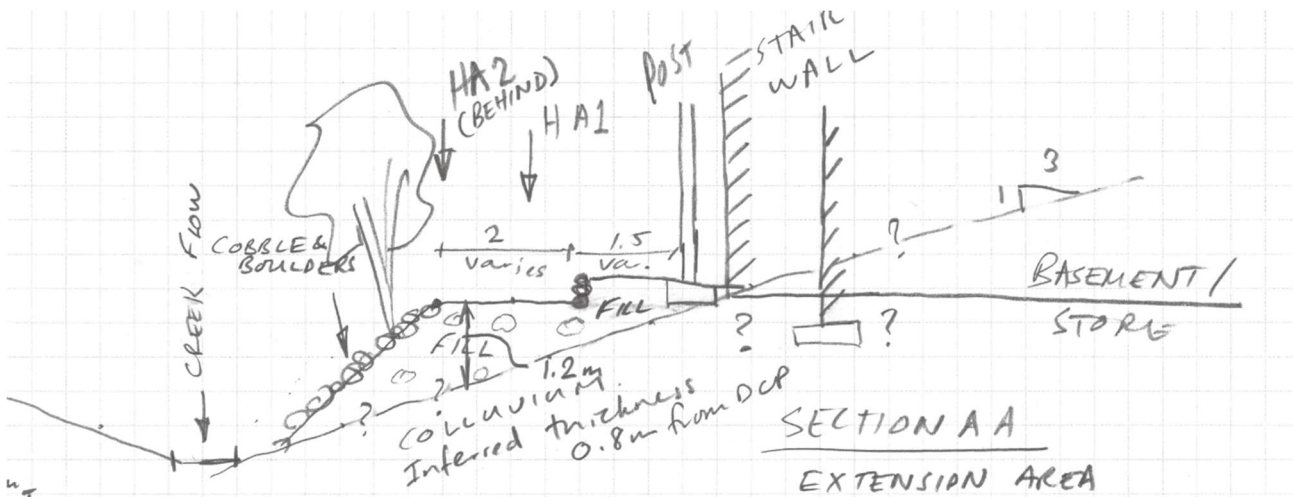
Cross-section field sketch of the geotechnical model at the extension area (existing conditions). Note fill wedge overlying colluvial soil.
